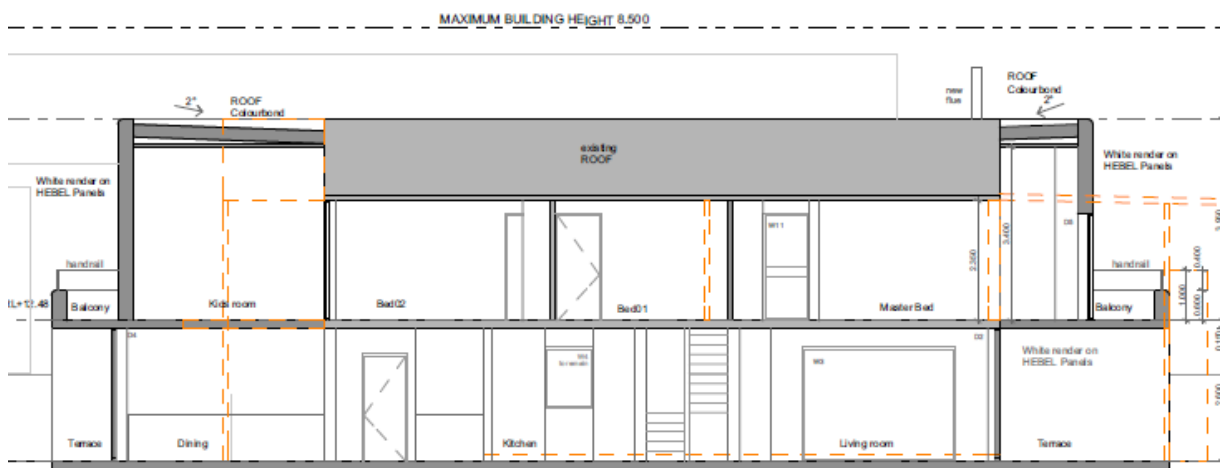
Plan extract showing compliance with 8.5m height control (source: Drew Heath Architect)
